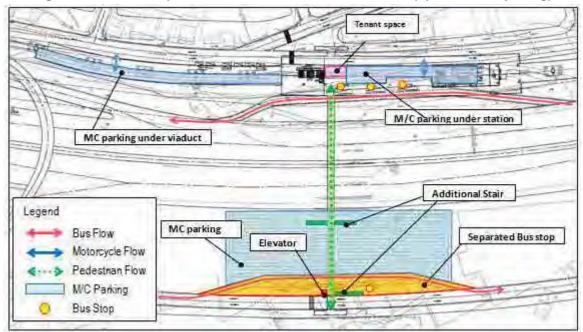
Concept Plan of the Rach Chiec Station Area (upon UMRT opening)
